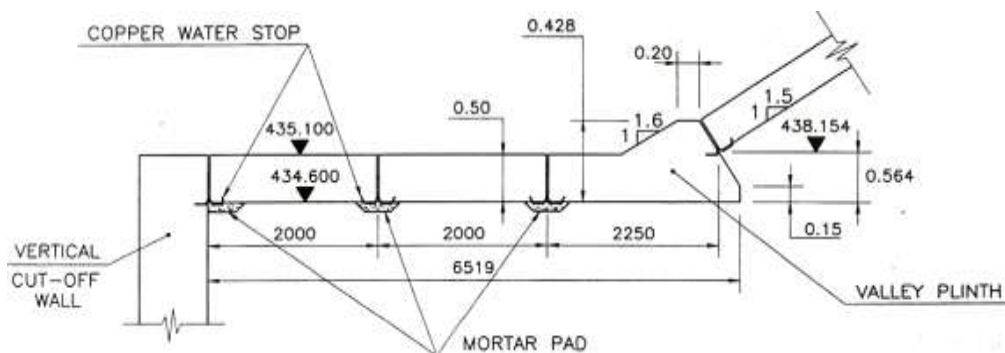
Plinth structure and perimetric joint detail of Puclaro Dam (Noguera et al 1999).
